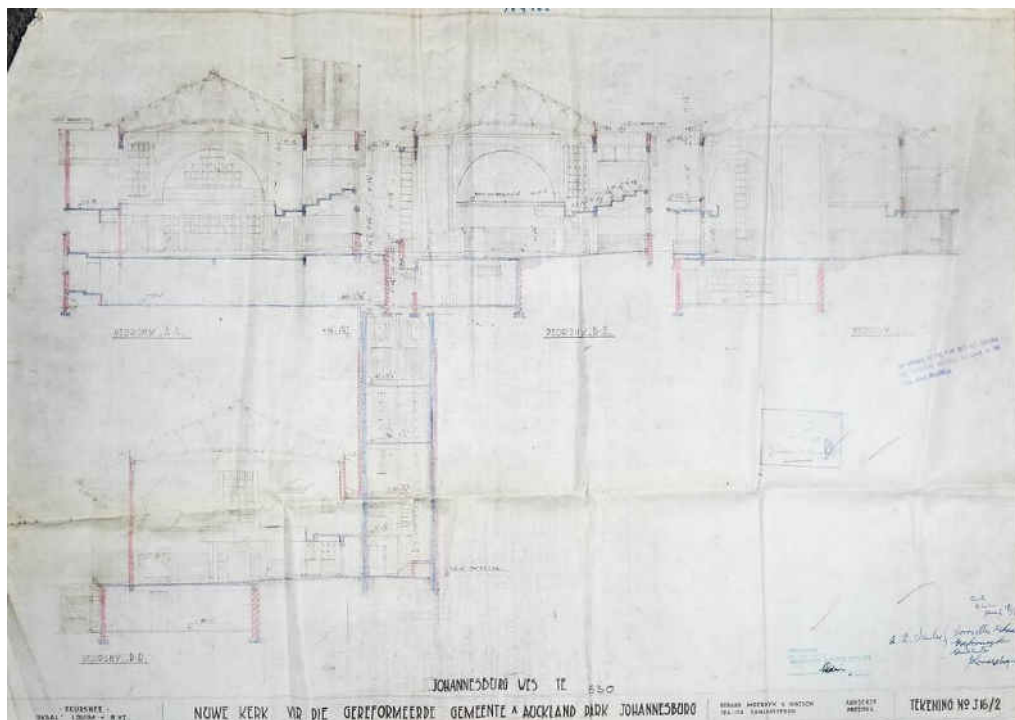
Original section plan for the Nuwe Kerk vir die Gereformeerde Gemeente Auckland Park from 1934
